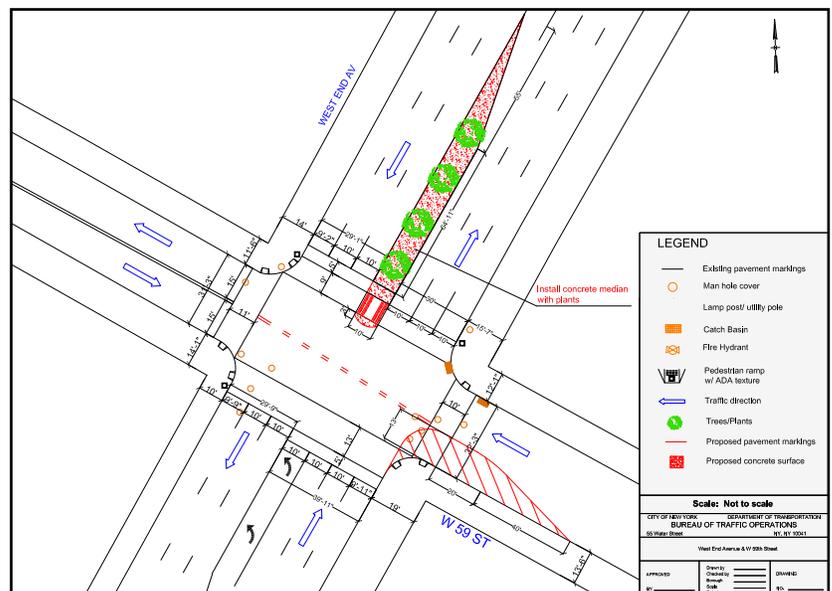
Proposed Condition - West End Avenue & West 59th Street
